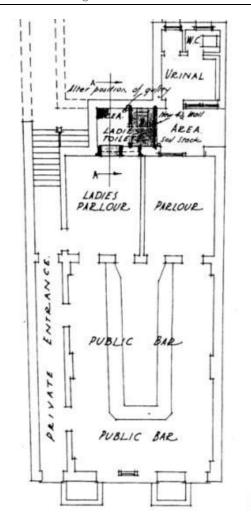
Fortune of War Hotel, 137 George Street, works to the Front Light Area (now gaming room G.26), 1940. The ladies' toilets were created within the outdoor 'Area' (yard) and a window to the ladies' parlour was converted to a door. The alteration was undertaken to comply with an order made under S.40A of the Liquor Act. 132 Source: SRNSW Plan No. 72428.
